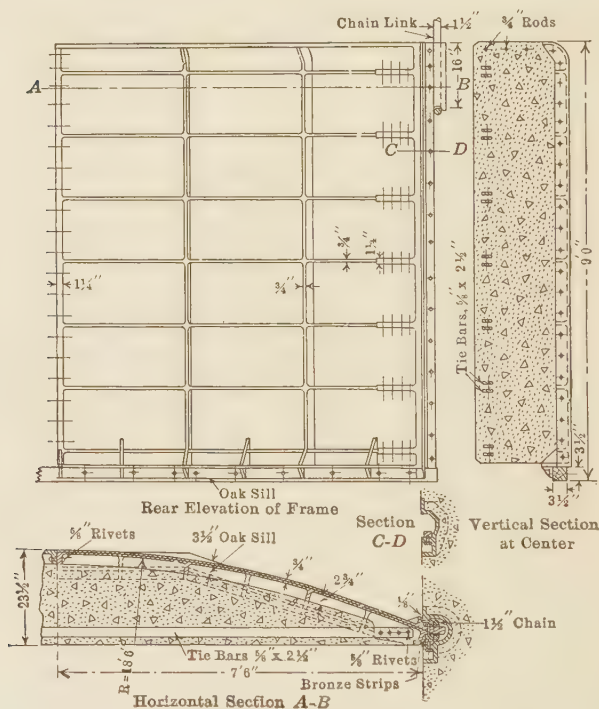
Details of sluiceway gate, Granite Reef Diversion Works.
